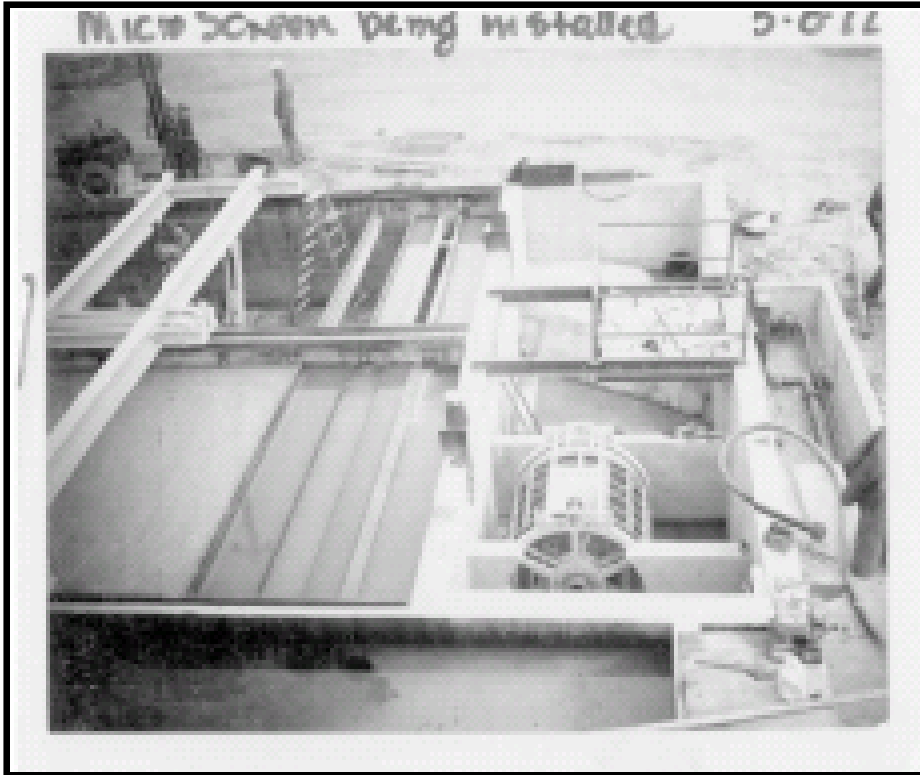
May 6, 1972 photo. View looking northwest from WWTP roof at new Precipitation and Flocculation tanks and equipment installation. North settling tank was empty.
